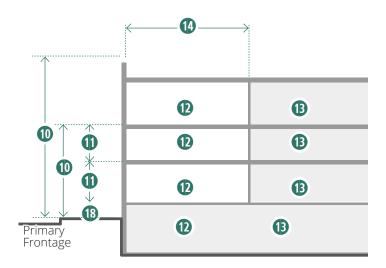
G-2. Workshop Building: Height & Use Requirements
